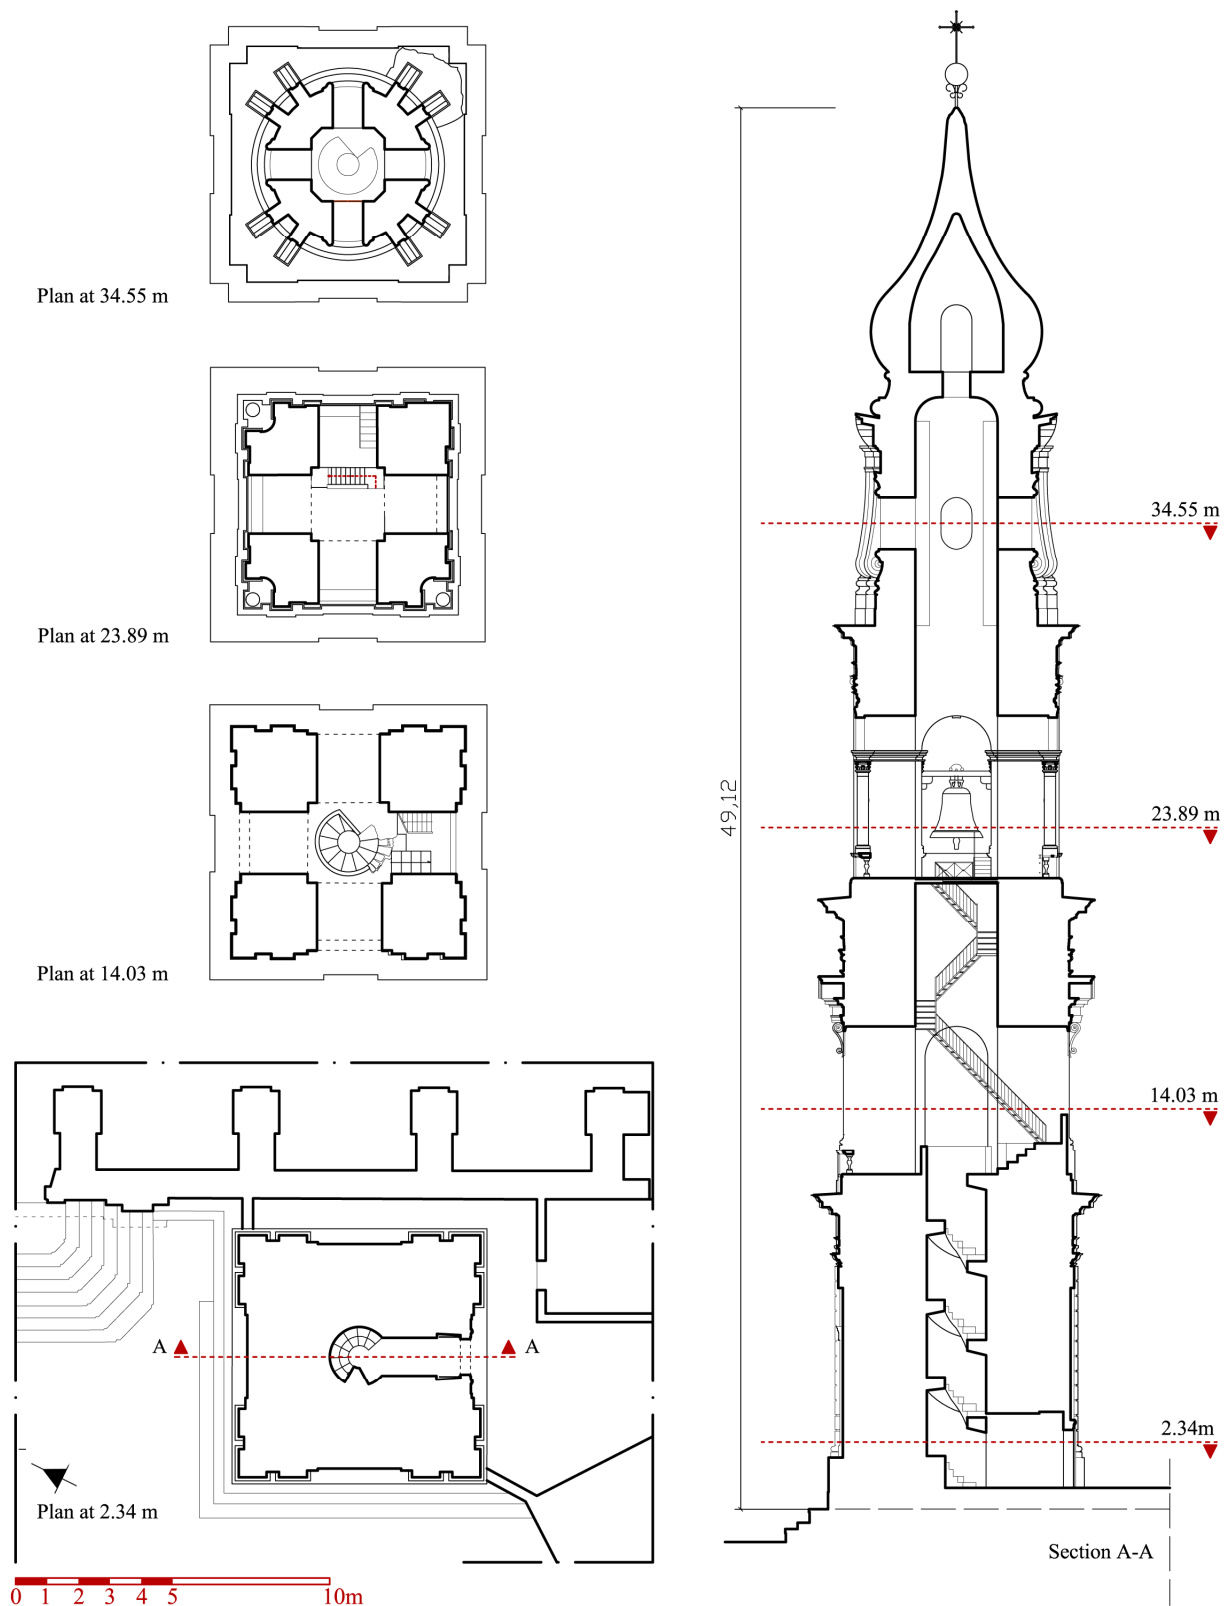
Plans and section of the “Corpus Domini” bell tower.
